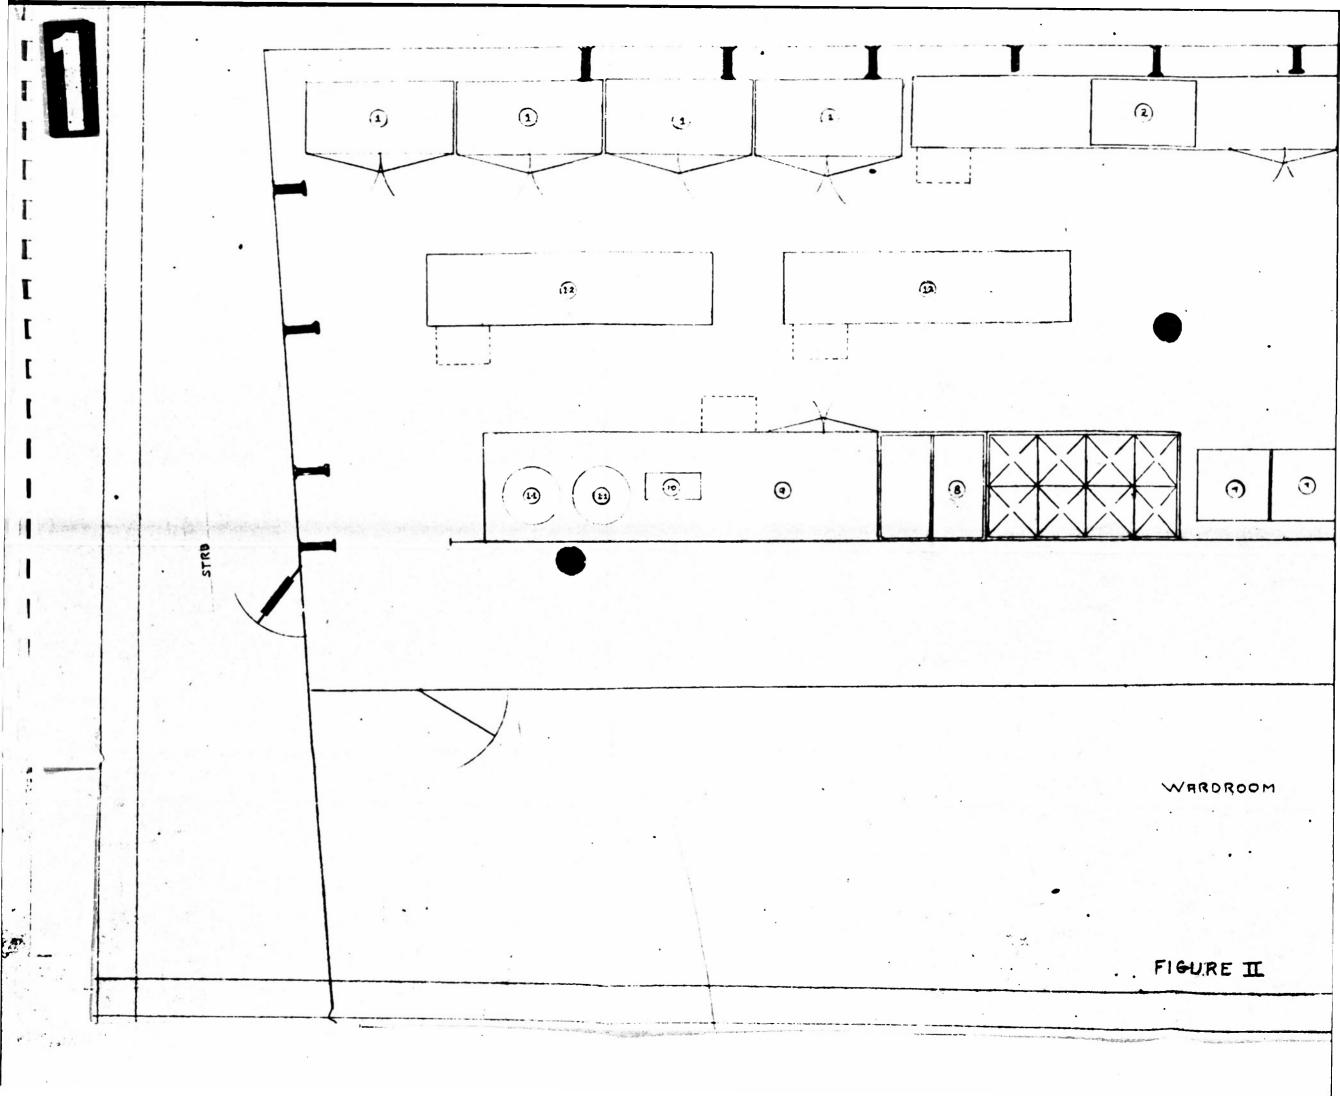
### FIGURE I - Plan C, Bearrangement of present galley facilities on 3rd deck.
